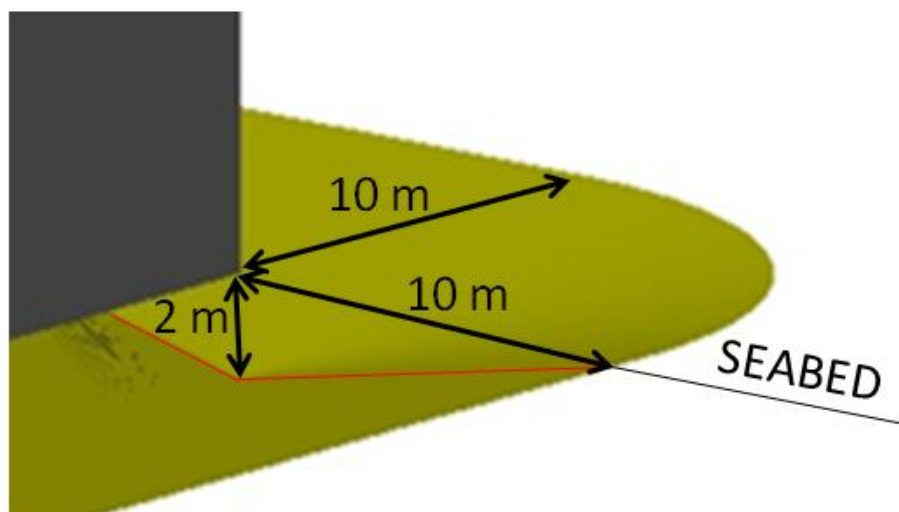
3D Rendering Detail SW Anchor Scour Vertical Wall
